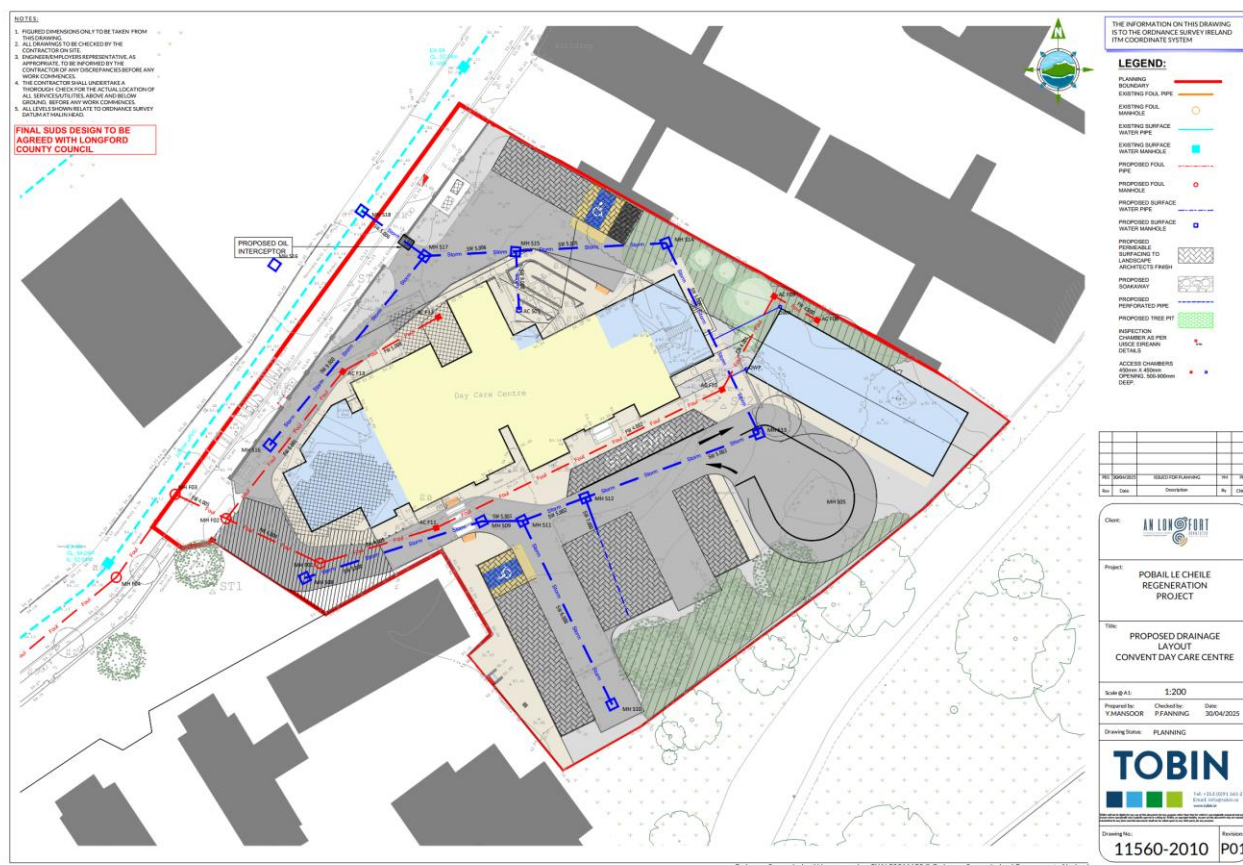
Proposed Convent Drainage, drawing 11560-2010
